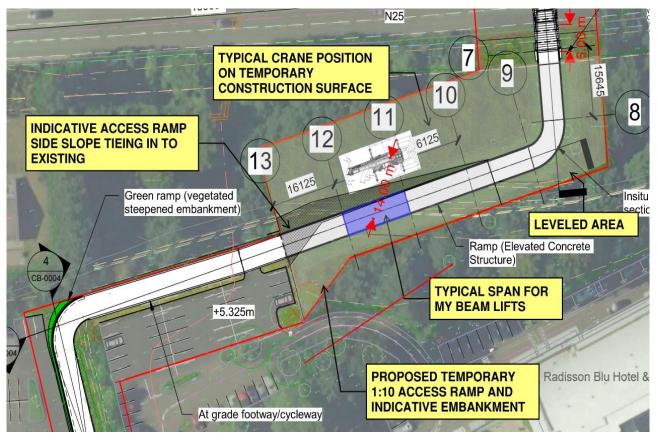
Proposed methodology for erection of southern elevated ramp precast concrete bridge beams
